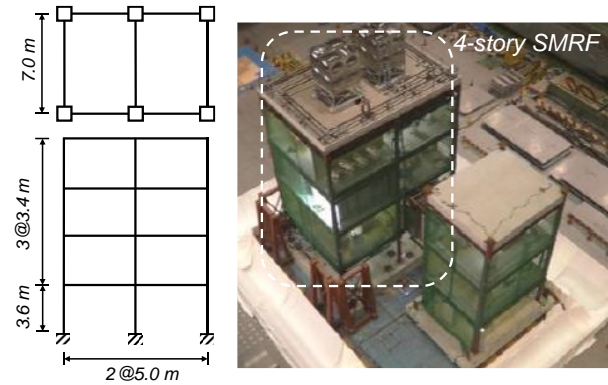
Floor plans and elevations, and photo of the adopted 4-story SMRF
